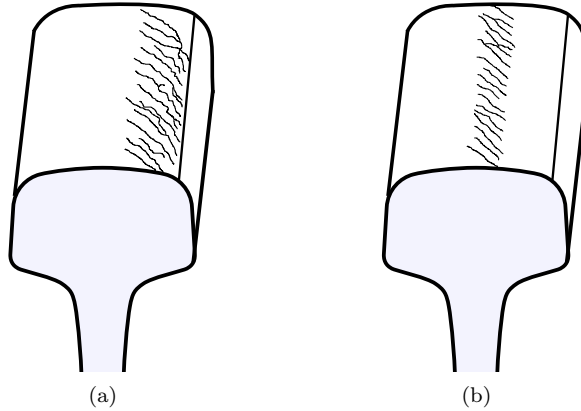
Typical appearance of (a) head checks on the gauge corner of the high rail and (b) head checks on the top surface.
